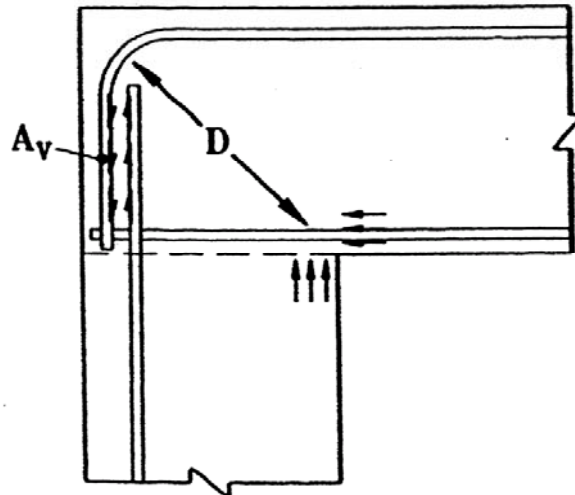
Transfer of Column Tension Force by Bond to Beam Steel (Adapted from Priestley, 1993)
